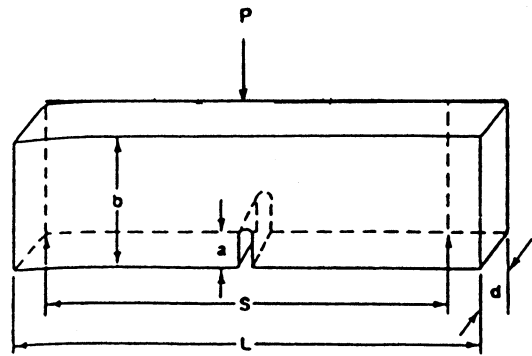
The shape and dimension of single-edged notch-beam specimen.
